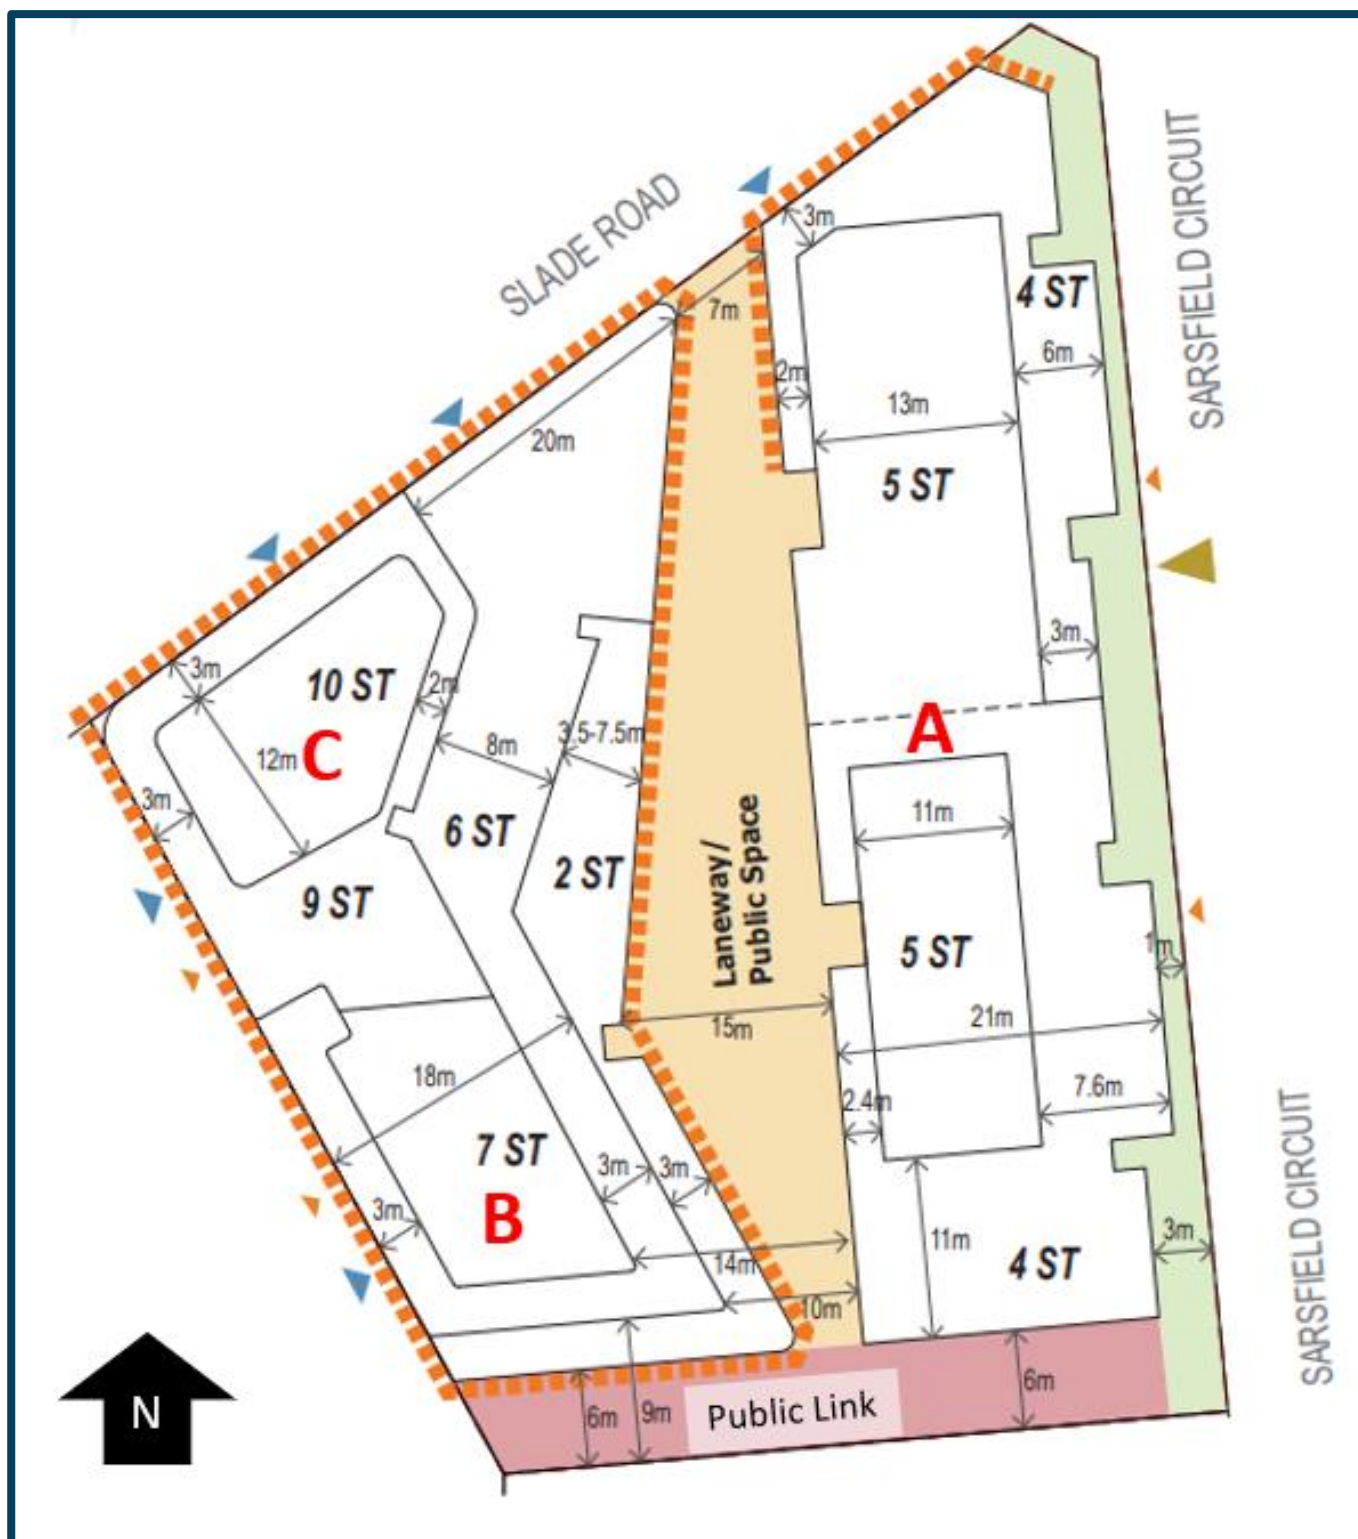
Site plan of concept scheme – please note the minor amendment to built forms B and C – see Section 3.3 of this report for further discussion (Source: The planning proposal’s Urban Design Report)
